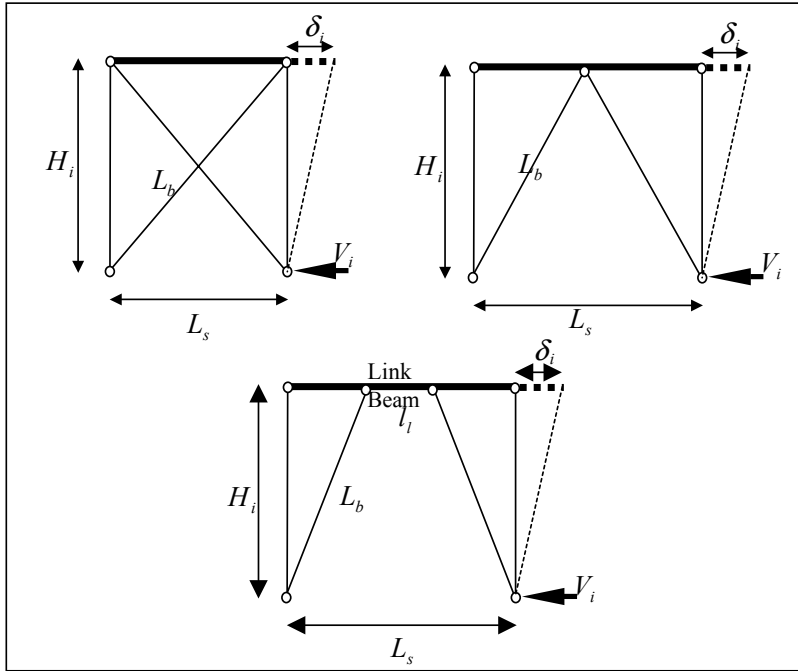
Structural models for (a) X bracing, (b) chevron bracing and (c) eccentric bracing systems
